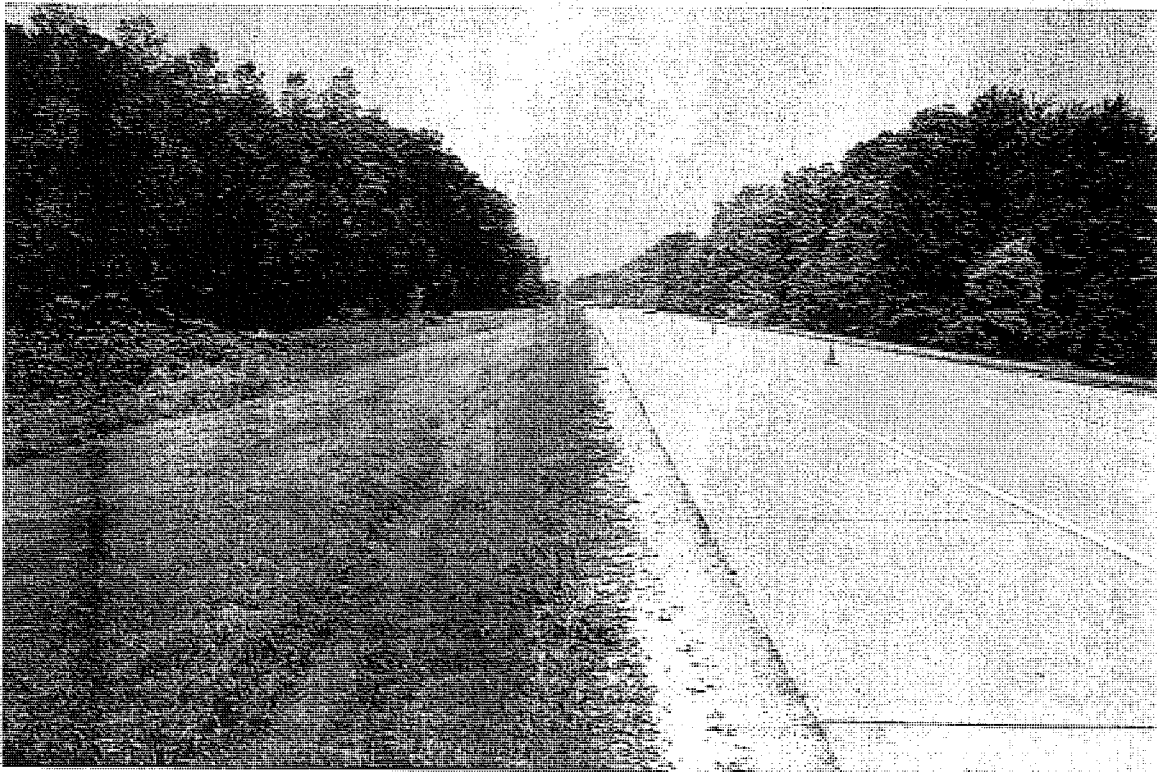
An overview looking west showing intermediate shoulder joints on CSN# 77023-21586A EB. The slabs in the driving lanes are 41 ft long.
